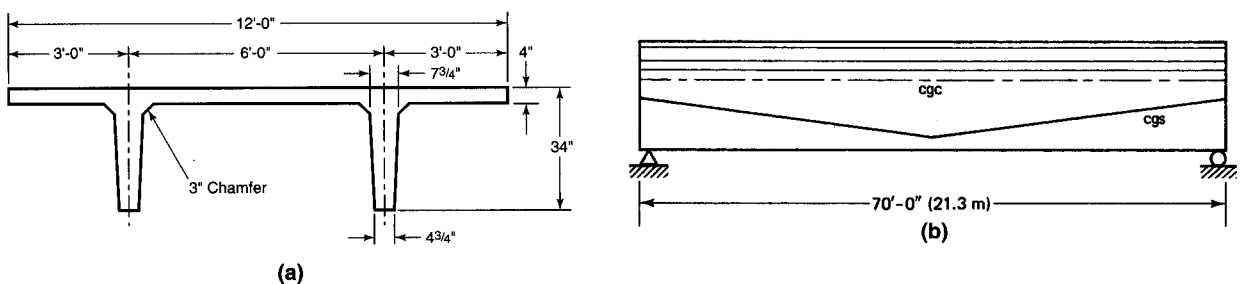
Beam geometry in Example 5.5. (a) Section. (b) Elevation.
